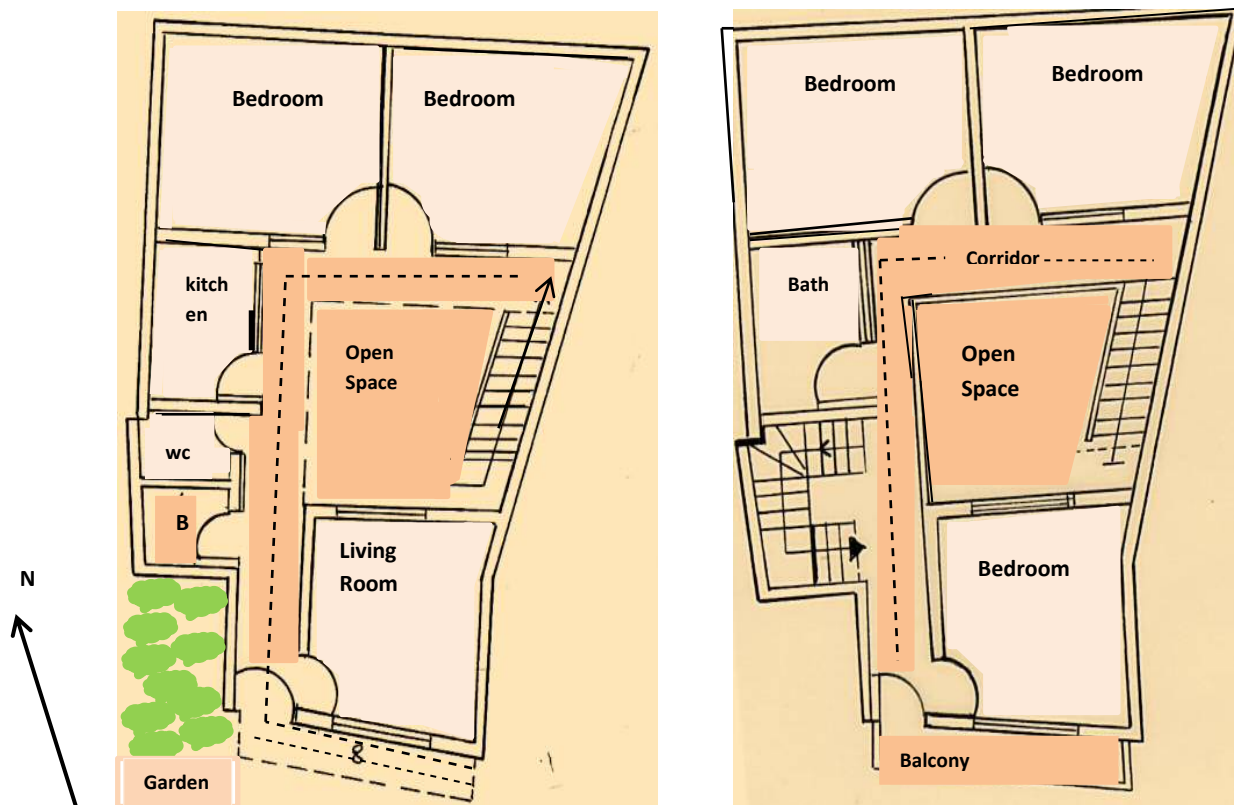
Ground floor level plan and first floor level plan of the selected modern house
